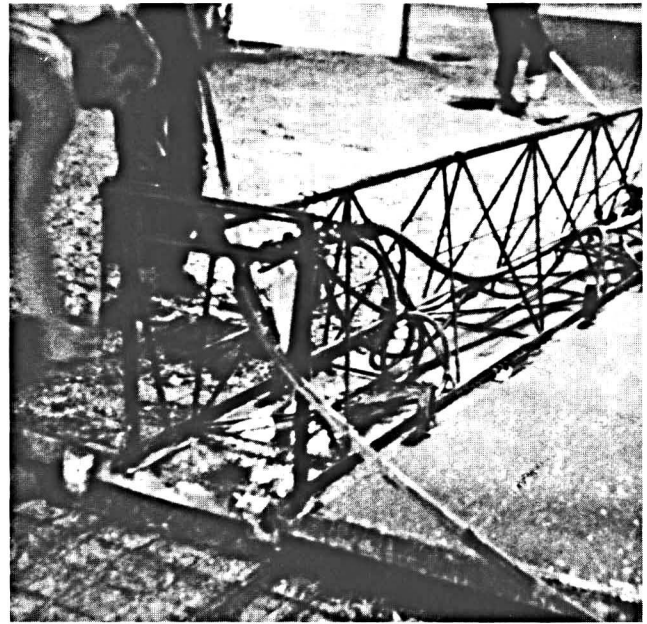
After strikeoff with vibratory equipment, the surface may be ready for finishing without darbying or bullfloating.
